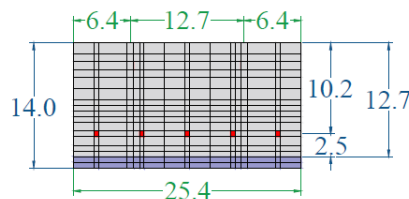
Fiber layout in the panel cross-sections (units in cm)
